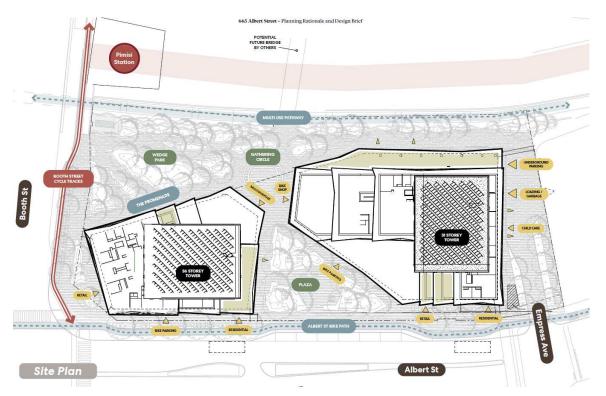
Layout of outdoor spaces, including the terrasses. The drawing also shows the location of a possible bridge crossing over the Confederation LRT Line that could be built by others. Source: Building LeBreton Library Parcel, 665 Albert Street, Planning Rational and Design Brief (Draft): 27.
